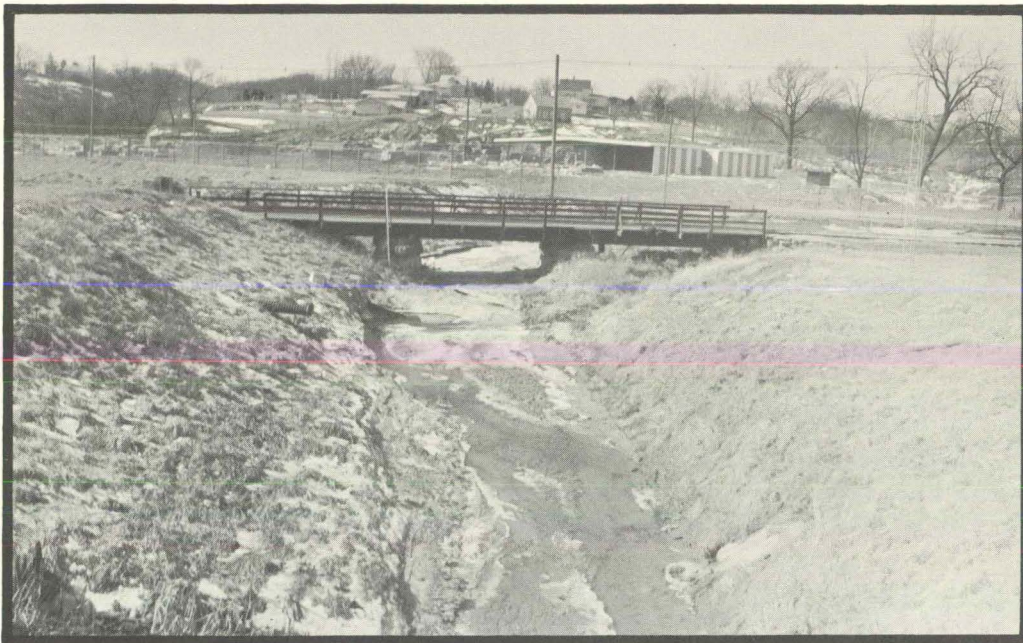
Railroad bridge at H. J. Heinz Company compound, looking downstream, Muscatine, Iowa.
